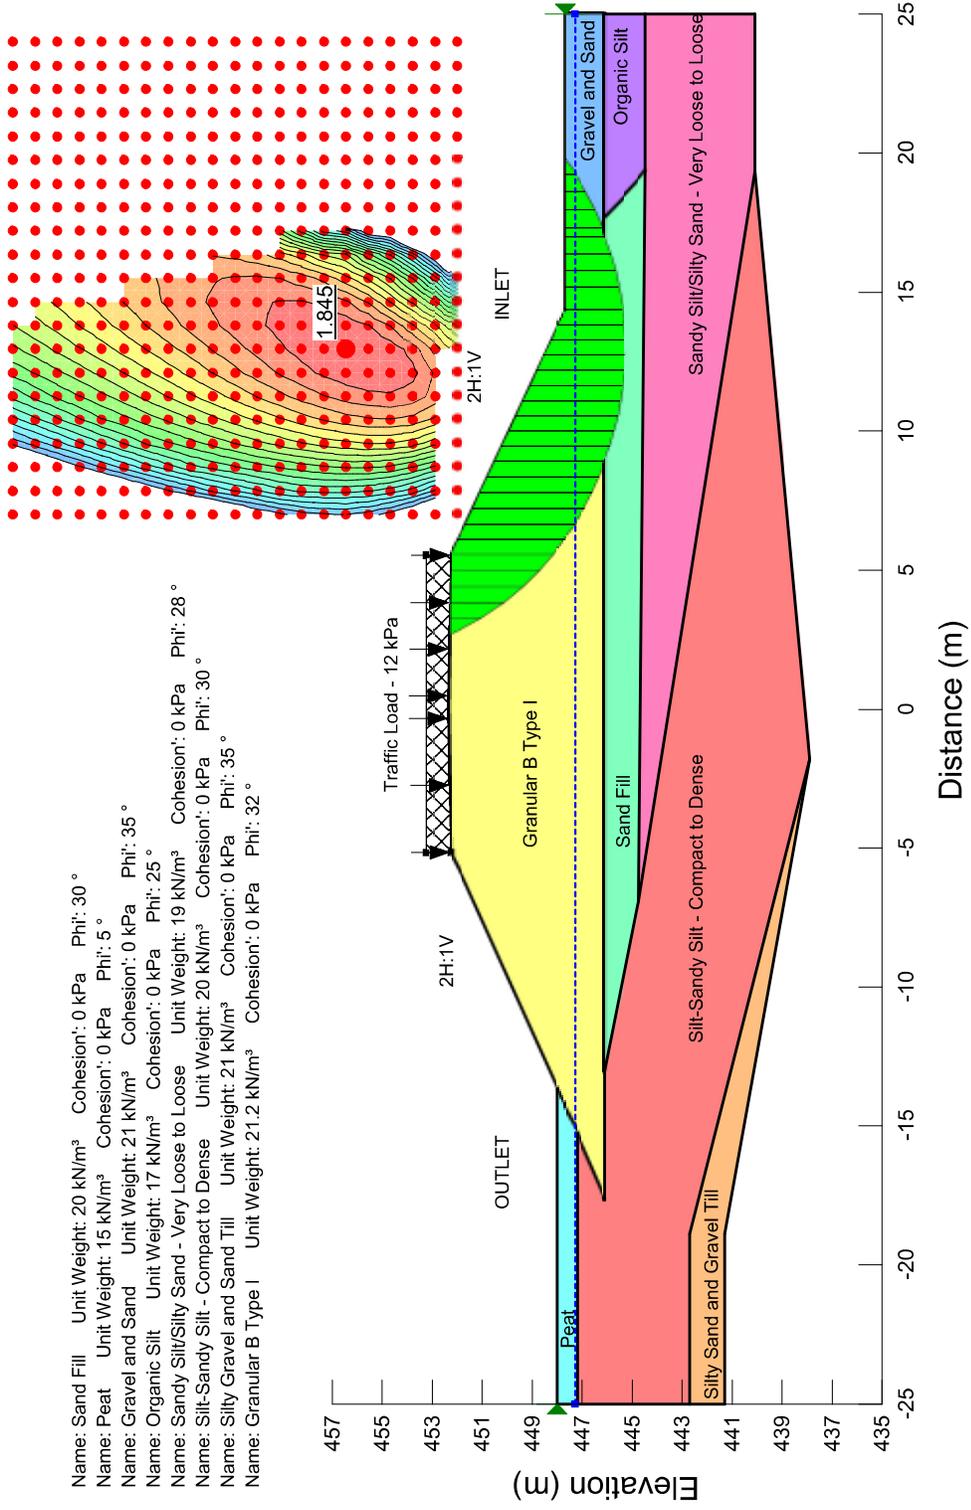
Proposed Embankment Stability - Outlet Side
